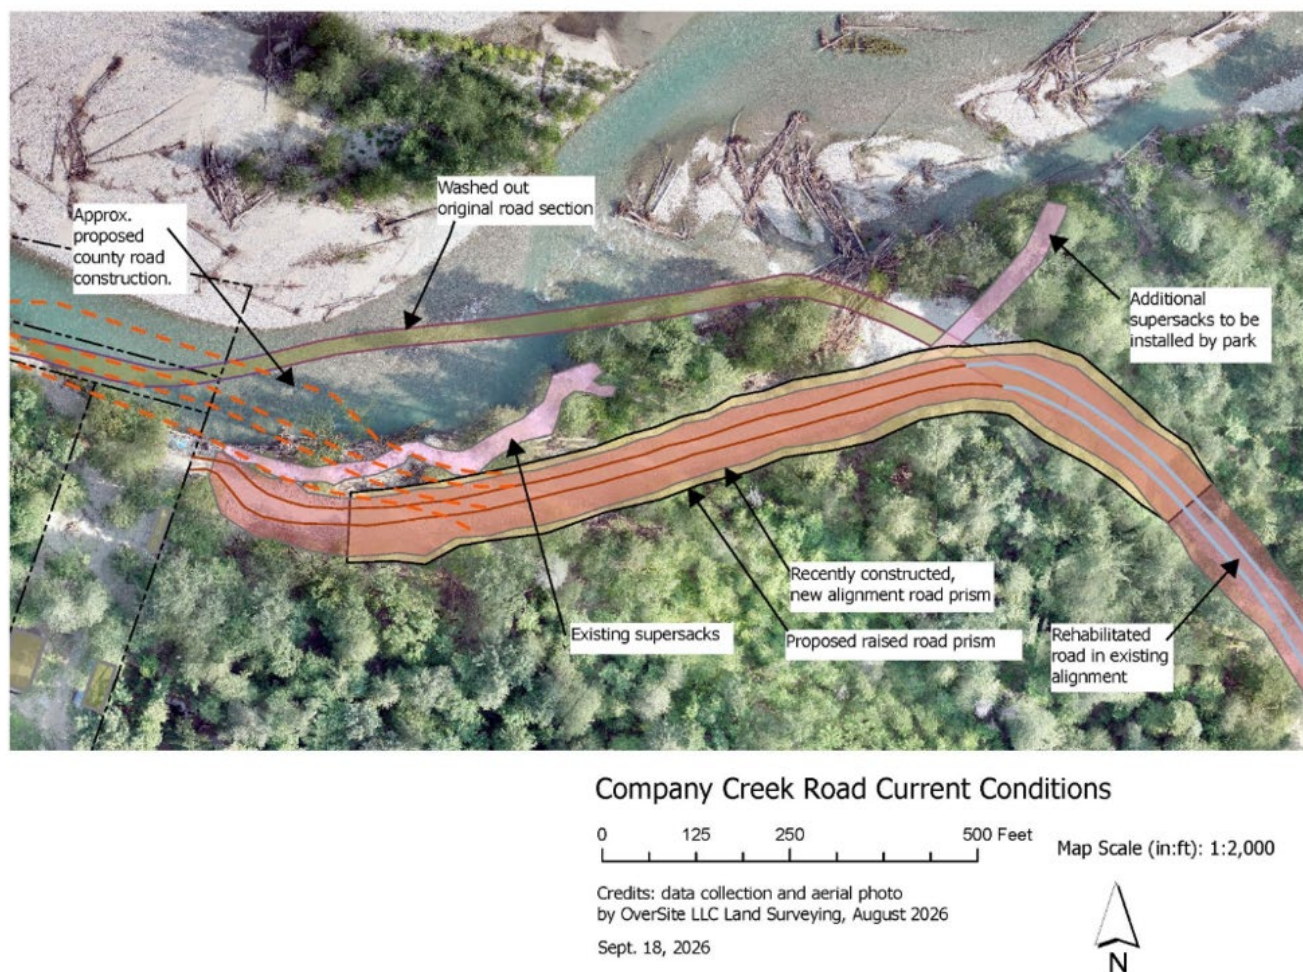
Detailed map of planned NPS work along Company Creek Road. Map shows enlarged footprint due to proposed road raising, addition of supersacks towards the northeast, and approximate location of where Chelan County's road will connect to NPS road.
